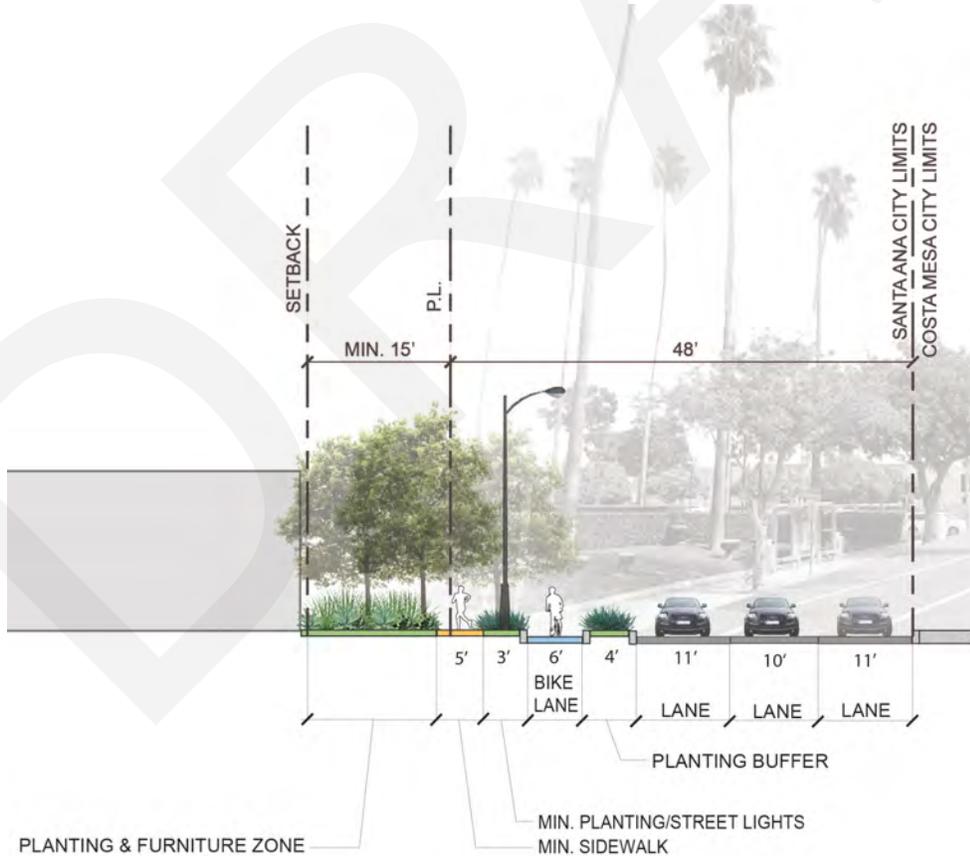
Sunflower Avenue Proposed Cross-Section
